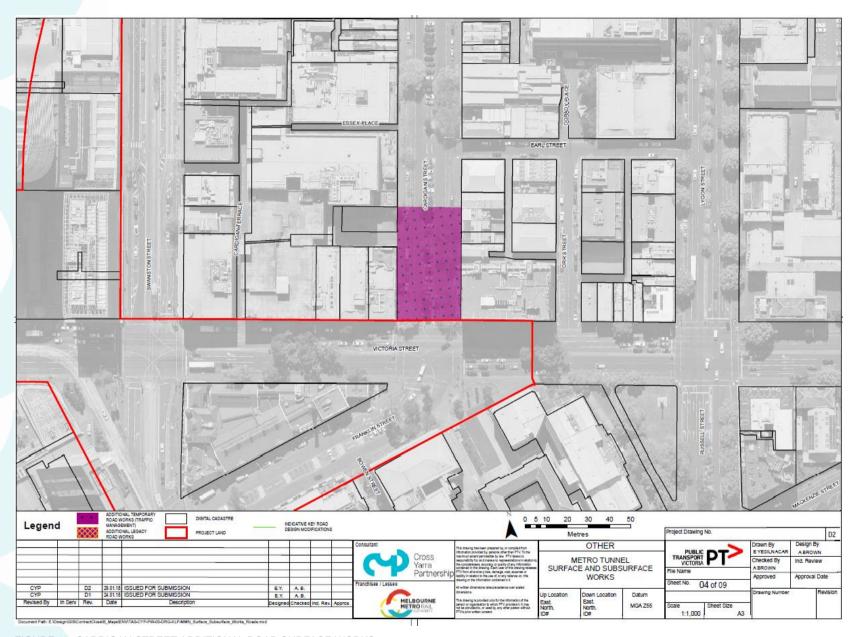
CARDIGAN STREET ADDITIONAL ROAD SURFACE WORKS
